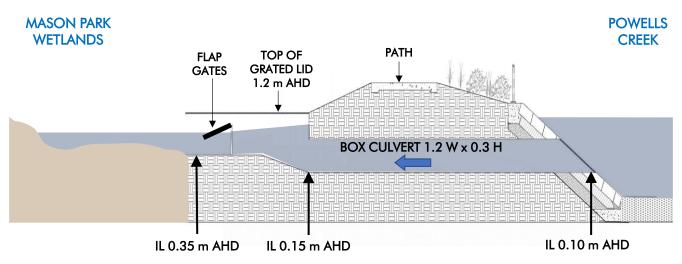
Existing inlet/outlet structure on Powells Creek at Mason Park
